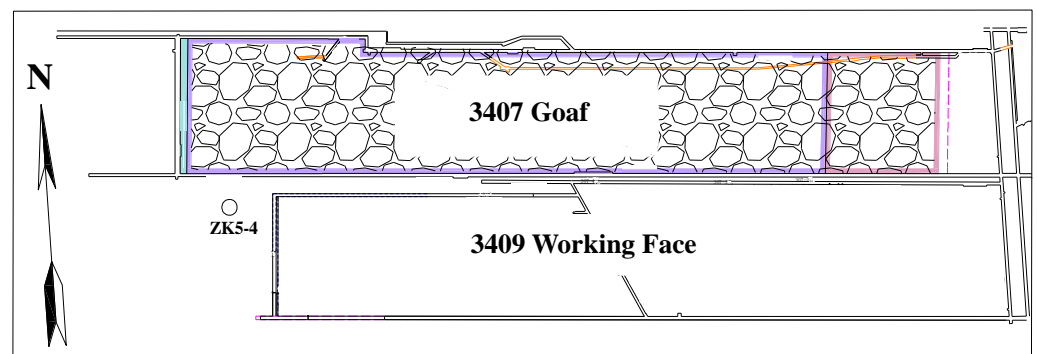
Layout plan of the 3409 working face in the Tingnan coal mine.
